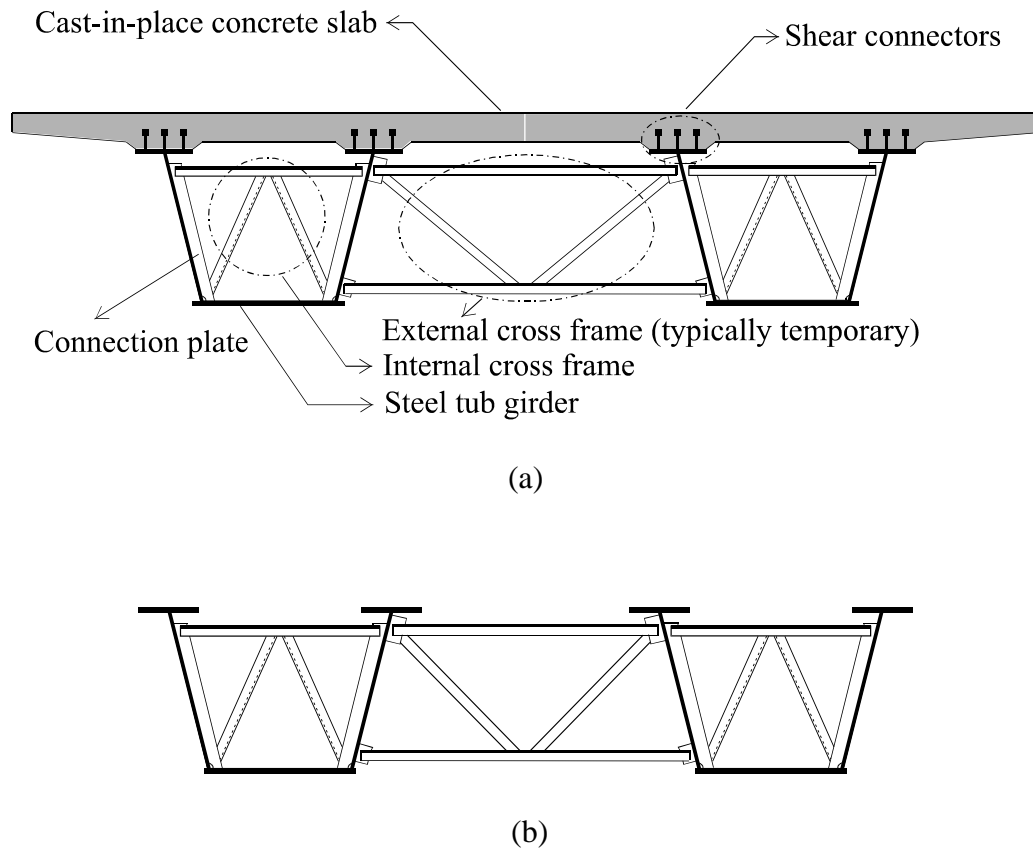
Twin-box girder bridge: (a) Completed stage; (b) Cross-section of steel tub girder during construction
